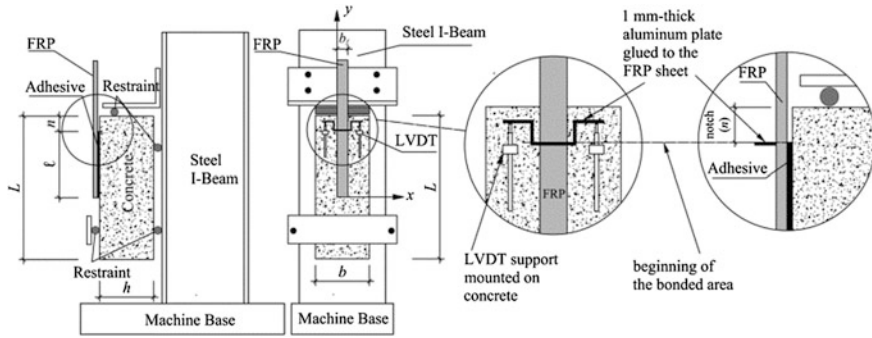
Specimen dimensions and loading arrangement (Subramaniam et al. 2007)
